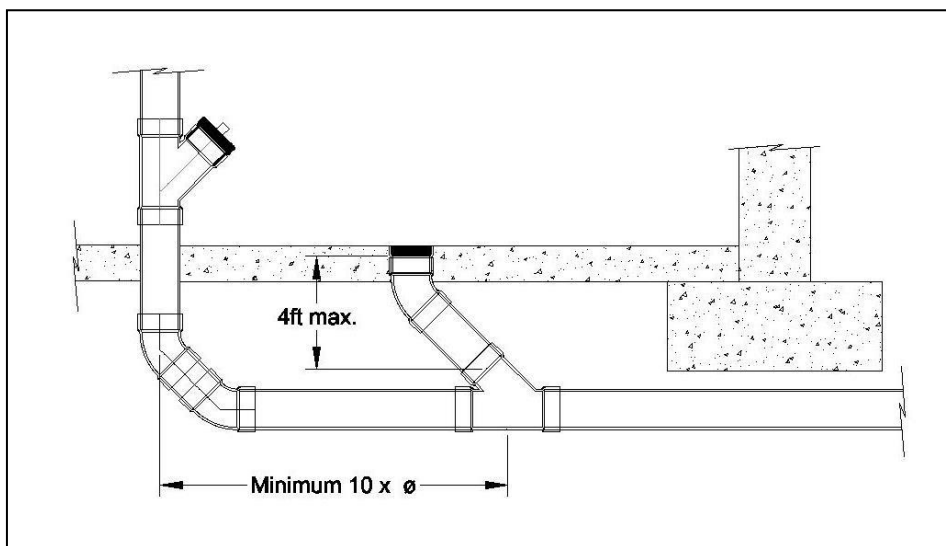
Typical installation –Cables used to extract the bladder limit the installation depth to 4ft. To limit presence of detergent suds we recommend sensors to be 10x pipe diameter away from plumbing stack.
